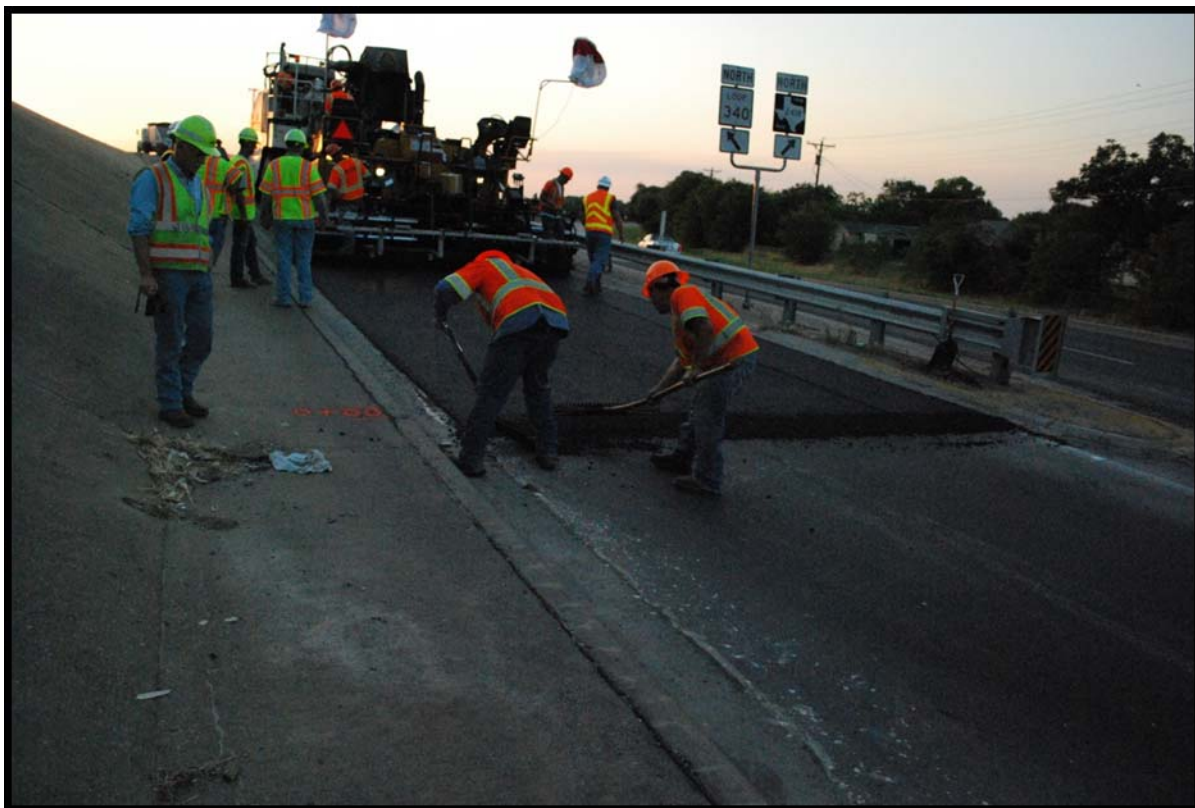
Paving on Loop 340 with Pave-IR Data Being Collected.
